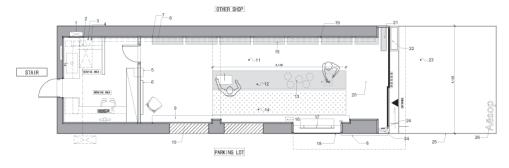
Aesop skincare store floor plan 1 (Aesop, 2016).
